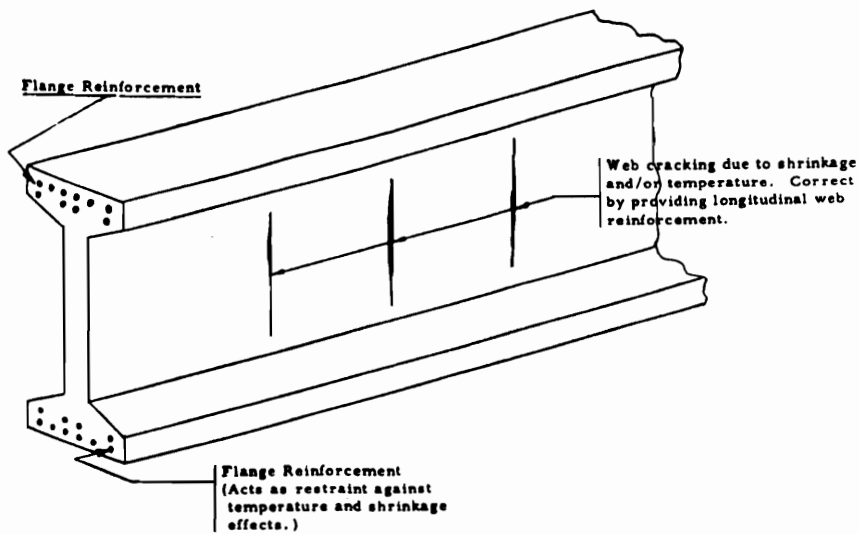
Web cracking in flanged concrete girder. (Johnson, 1965, p. 95).
